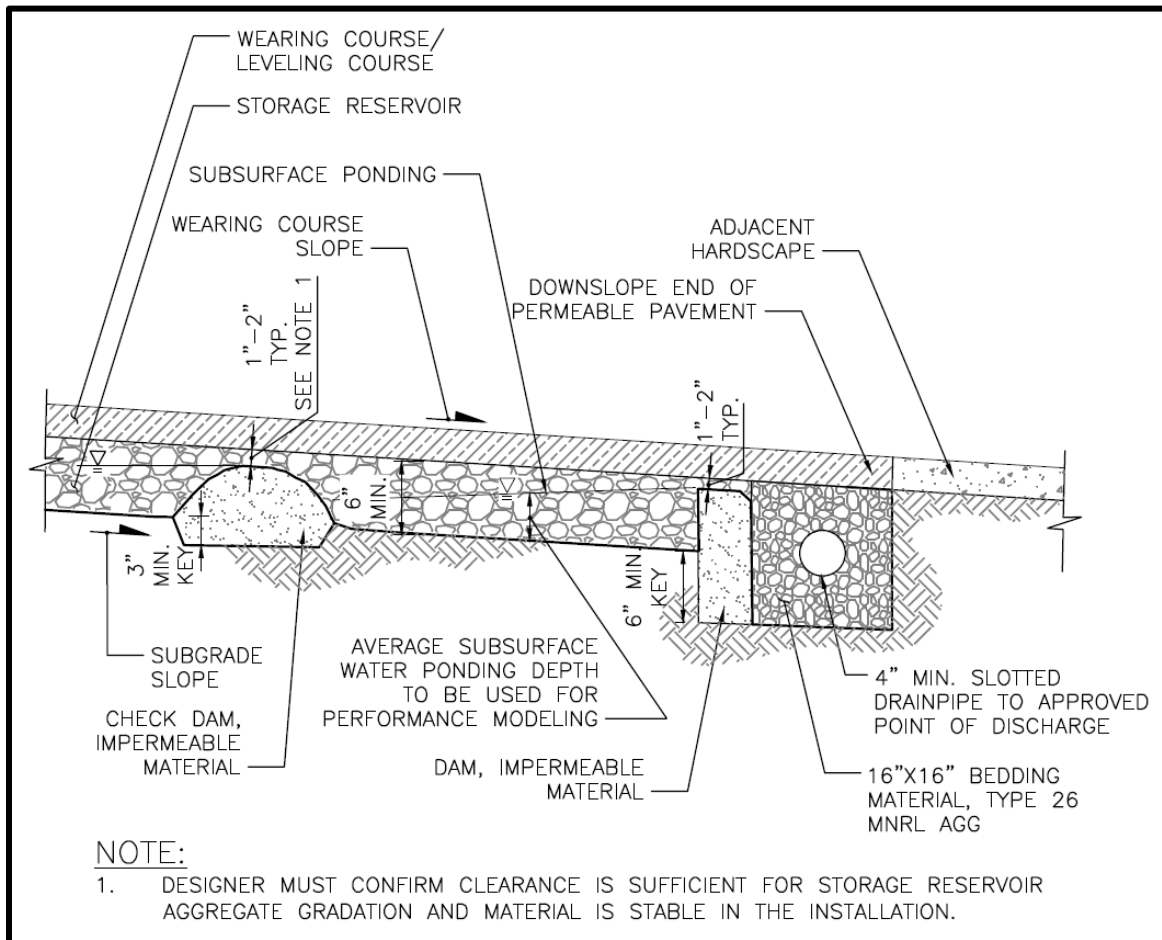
Typical Permeable Pavement Facility with Checkdams.
